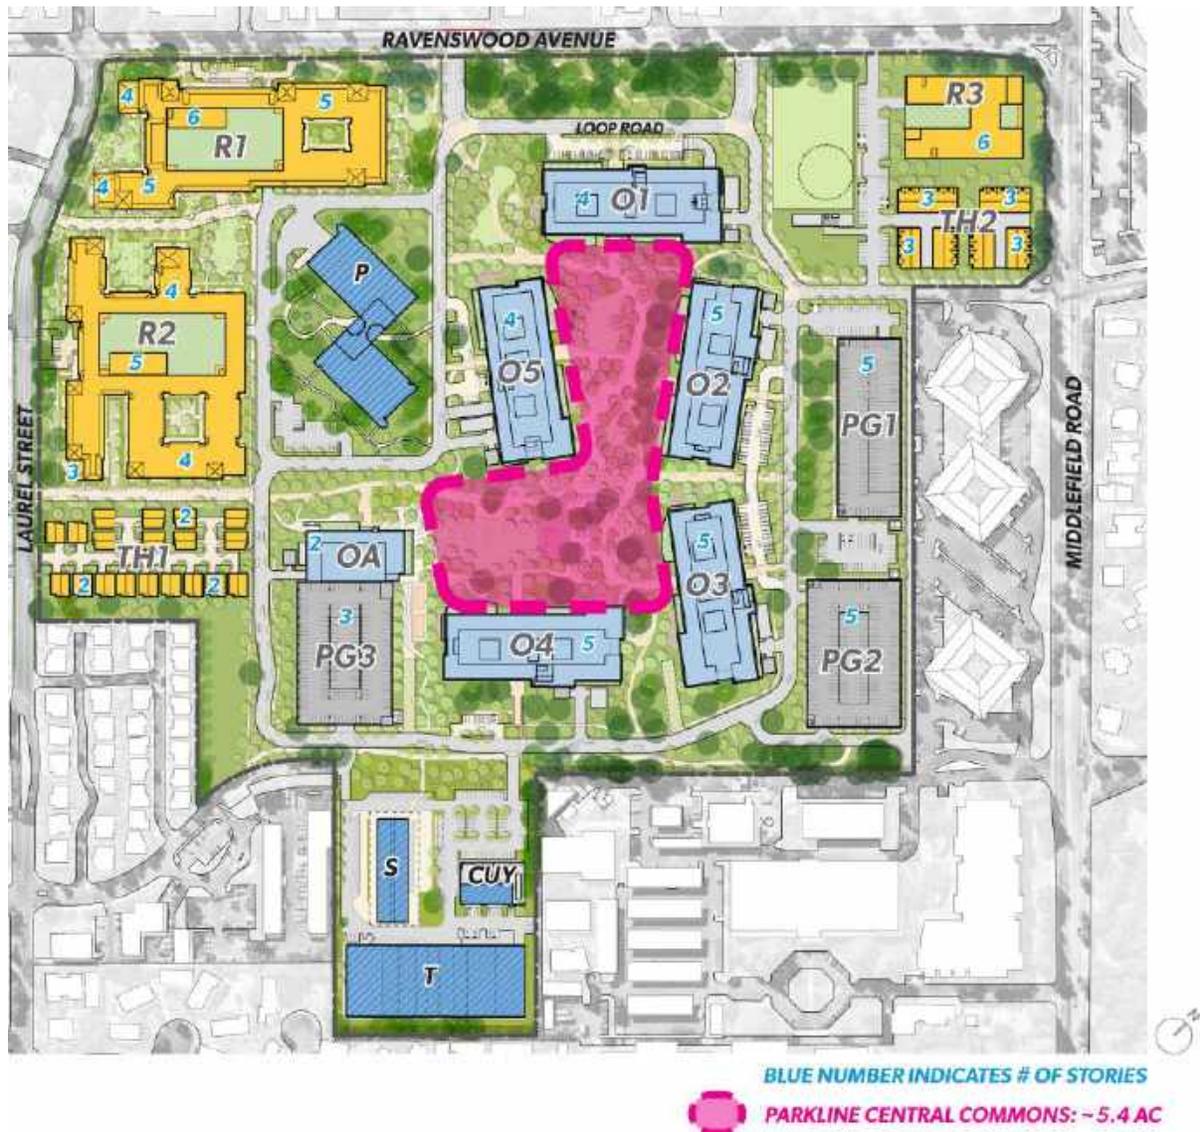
Project Site plan for Variant. Source: STUDIOS Architecture, “Lane Partners Parkline: Historic Resource Evaluation - Site Plan Alternatives – Variant (2024),” March 20, 2024.
